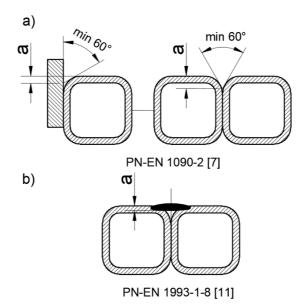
Interpretation of flare groove welds thickness according to: a) standard PN-EN 1090-2 [7] and b) standard PN-EN 1993-1-8 [11]
